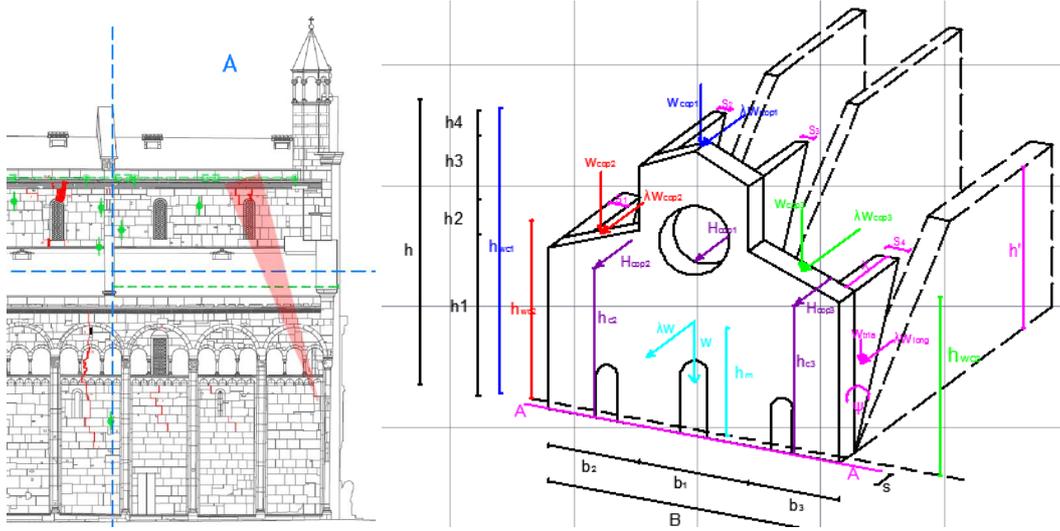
(a) Cracks in longitudinal walls of Cathedral, (b) Overturning of global façade around the base dashed straight line.
